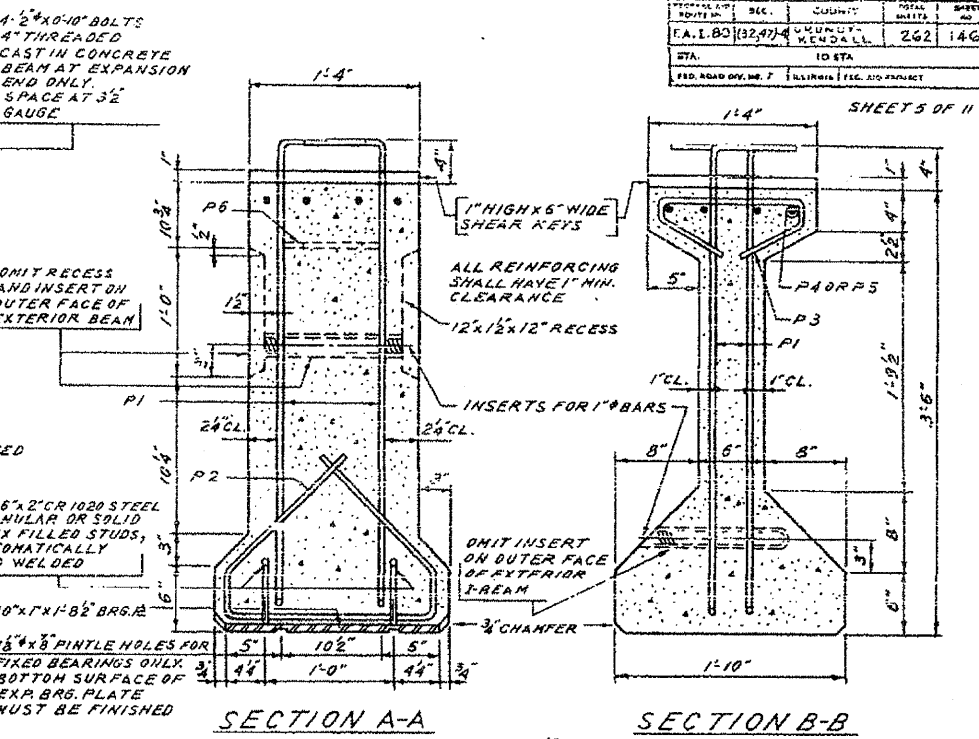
DETAILS OF PRESTRESSING STEEL FOR 67'-8" SPAN I-BEAMS
